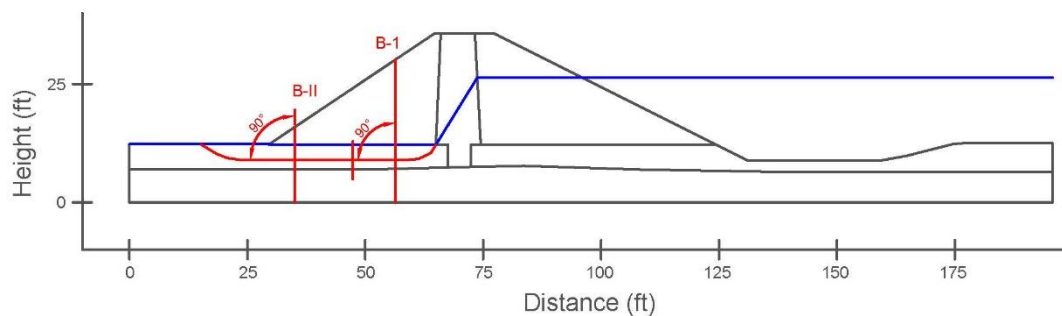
Sub-sectioning of the cross-section and failure plane for La Marquesa Dam – D/S Slope
